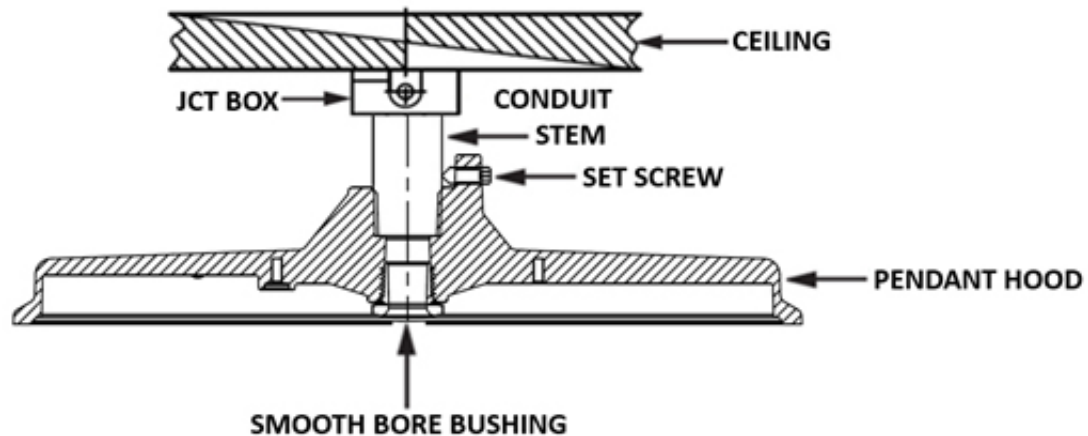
PENDANT HOOD DETAILS (SMOOTH BORE BUSHING VERSION)
